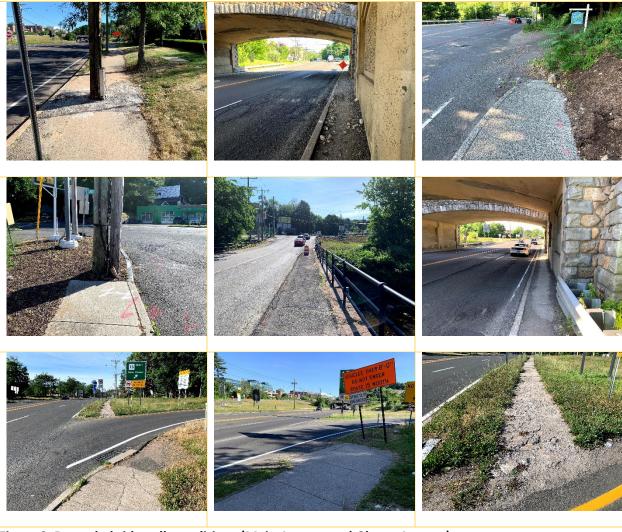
Degraded sidewalk conditions (Main Avenue and Glover Avenue)
